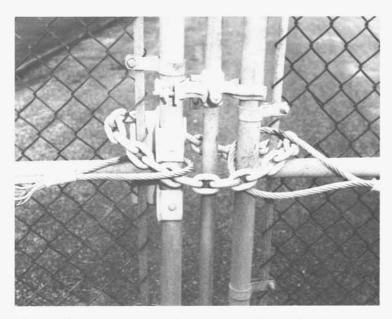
Wire rope strung across inside face of gate and fastened to pipe member.
